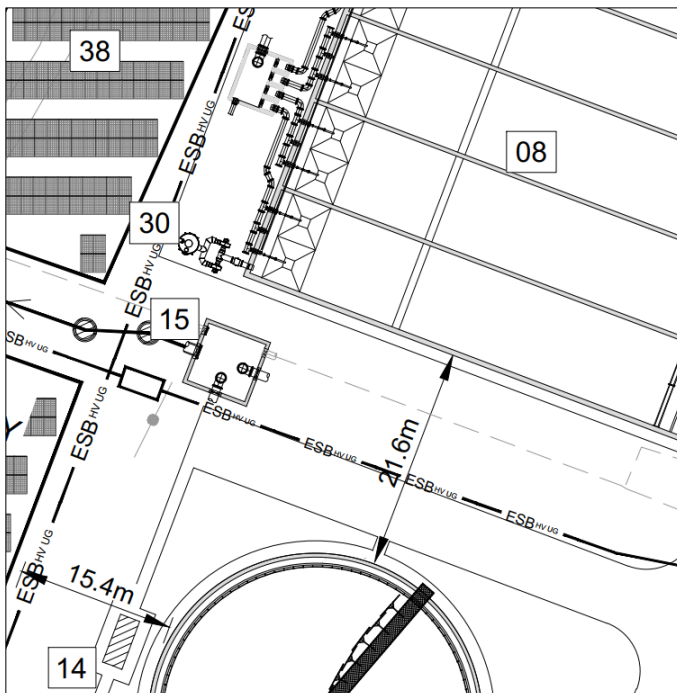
Drawings showing the proposed Micro TBM launch zone location and construction of the new Inlet Pump Station.
